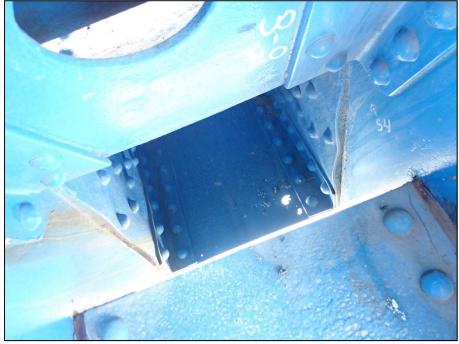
Unit II, Span 4, South truss at L0; two (2) 1-1/2" Dia corrosion holes in bottom plate
